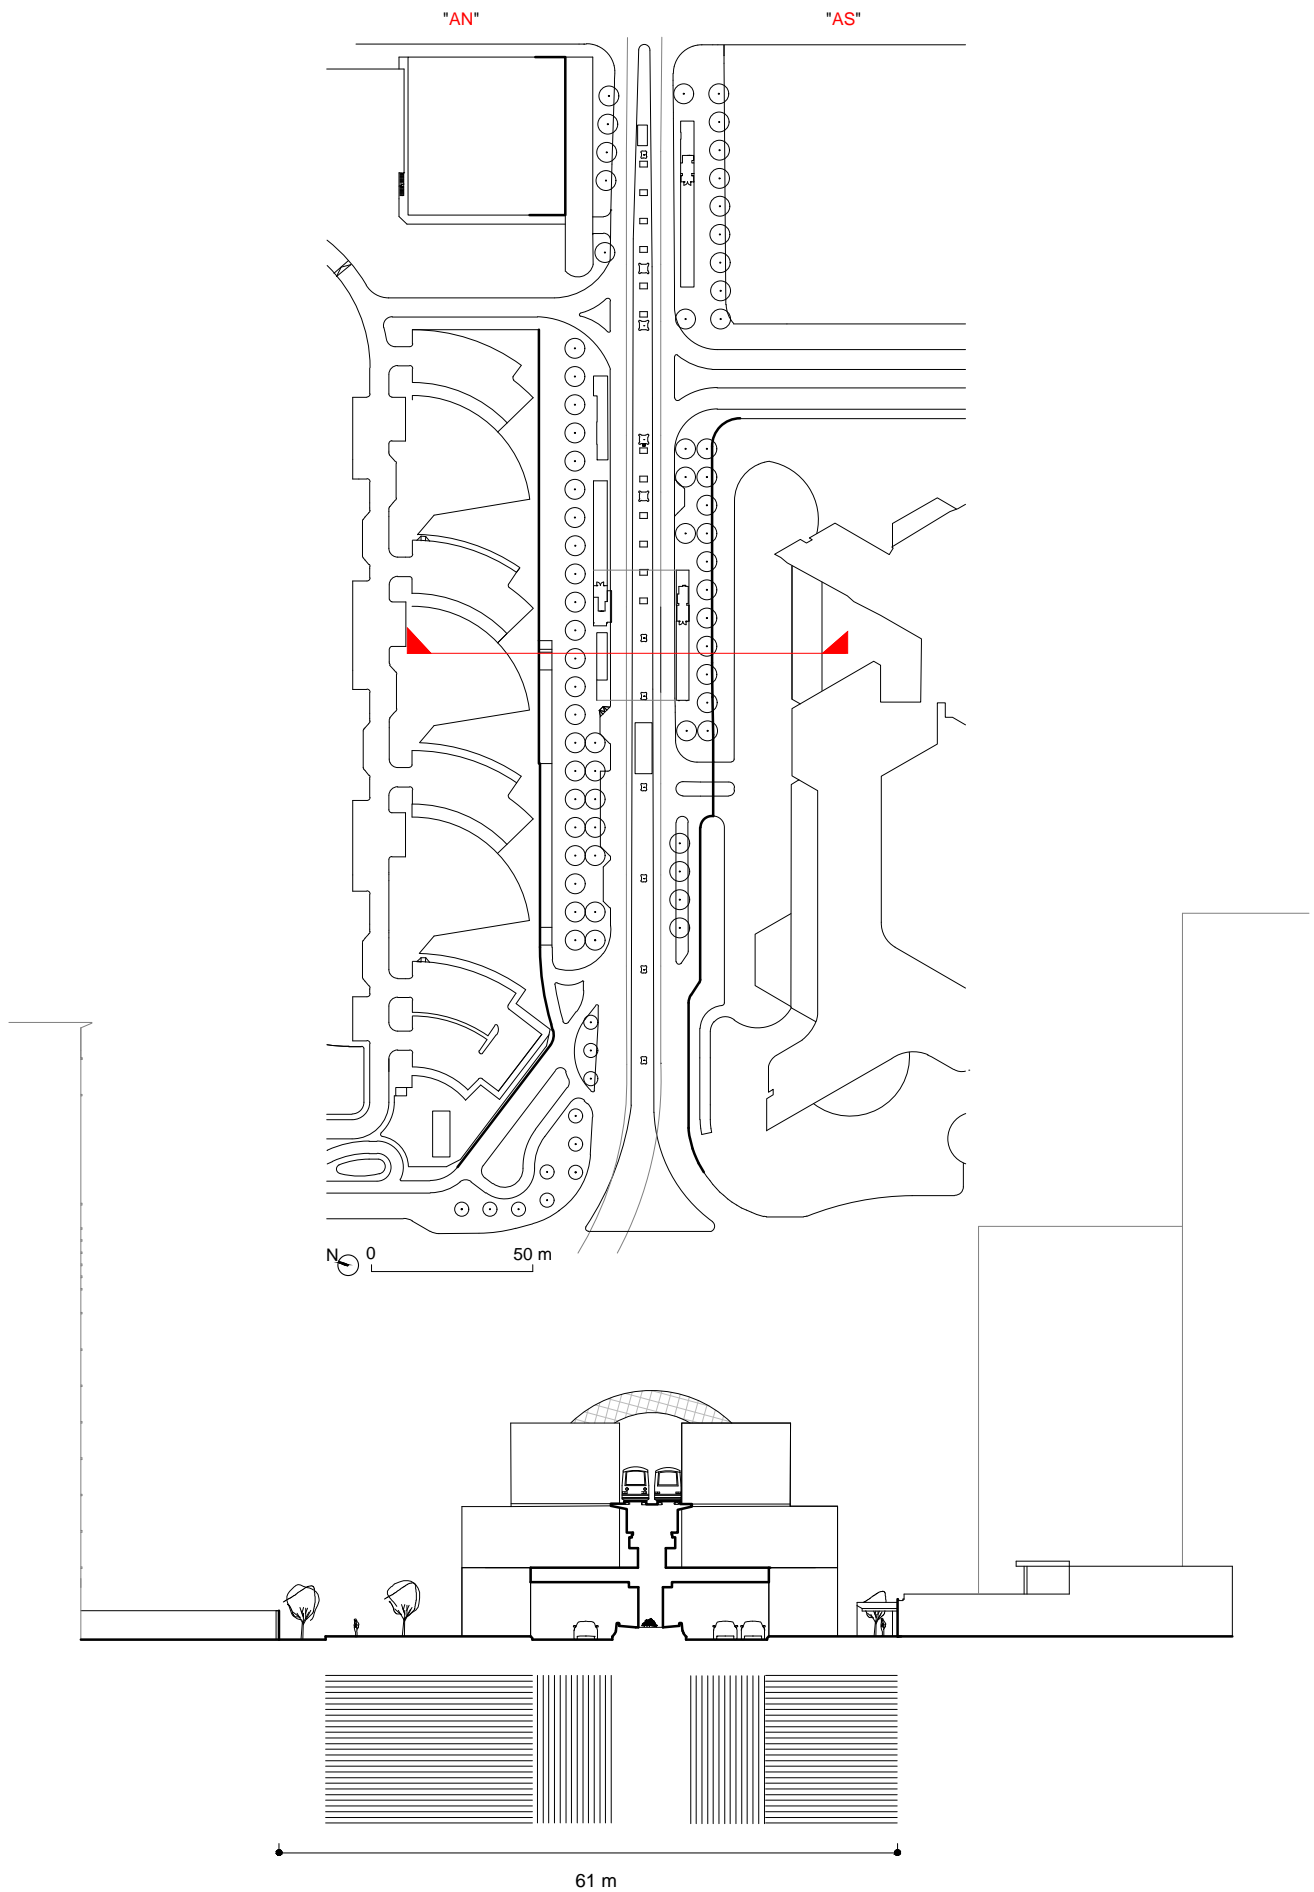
Abi Jafar Al Mansour Street: Plan and cross-section of sample "A." (Source: Author's Edition).
